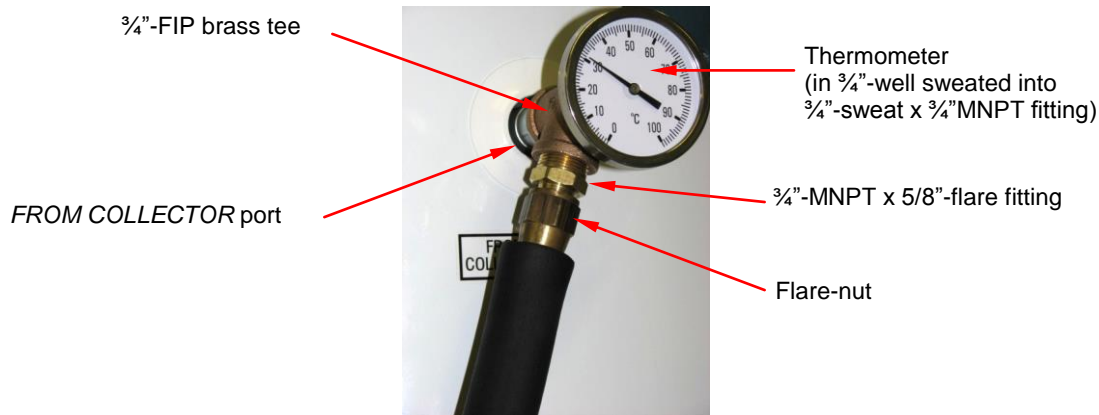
Thermosiphon riser includes brass tee with thermometer and L-soft copper tube assembly.
